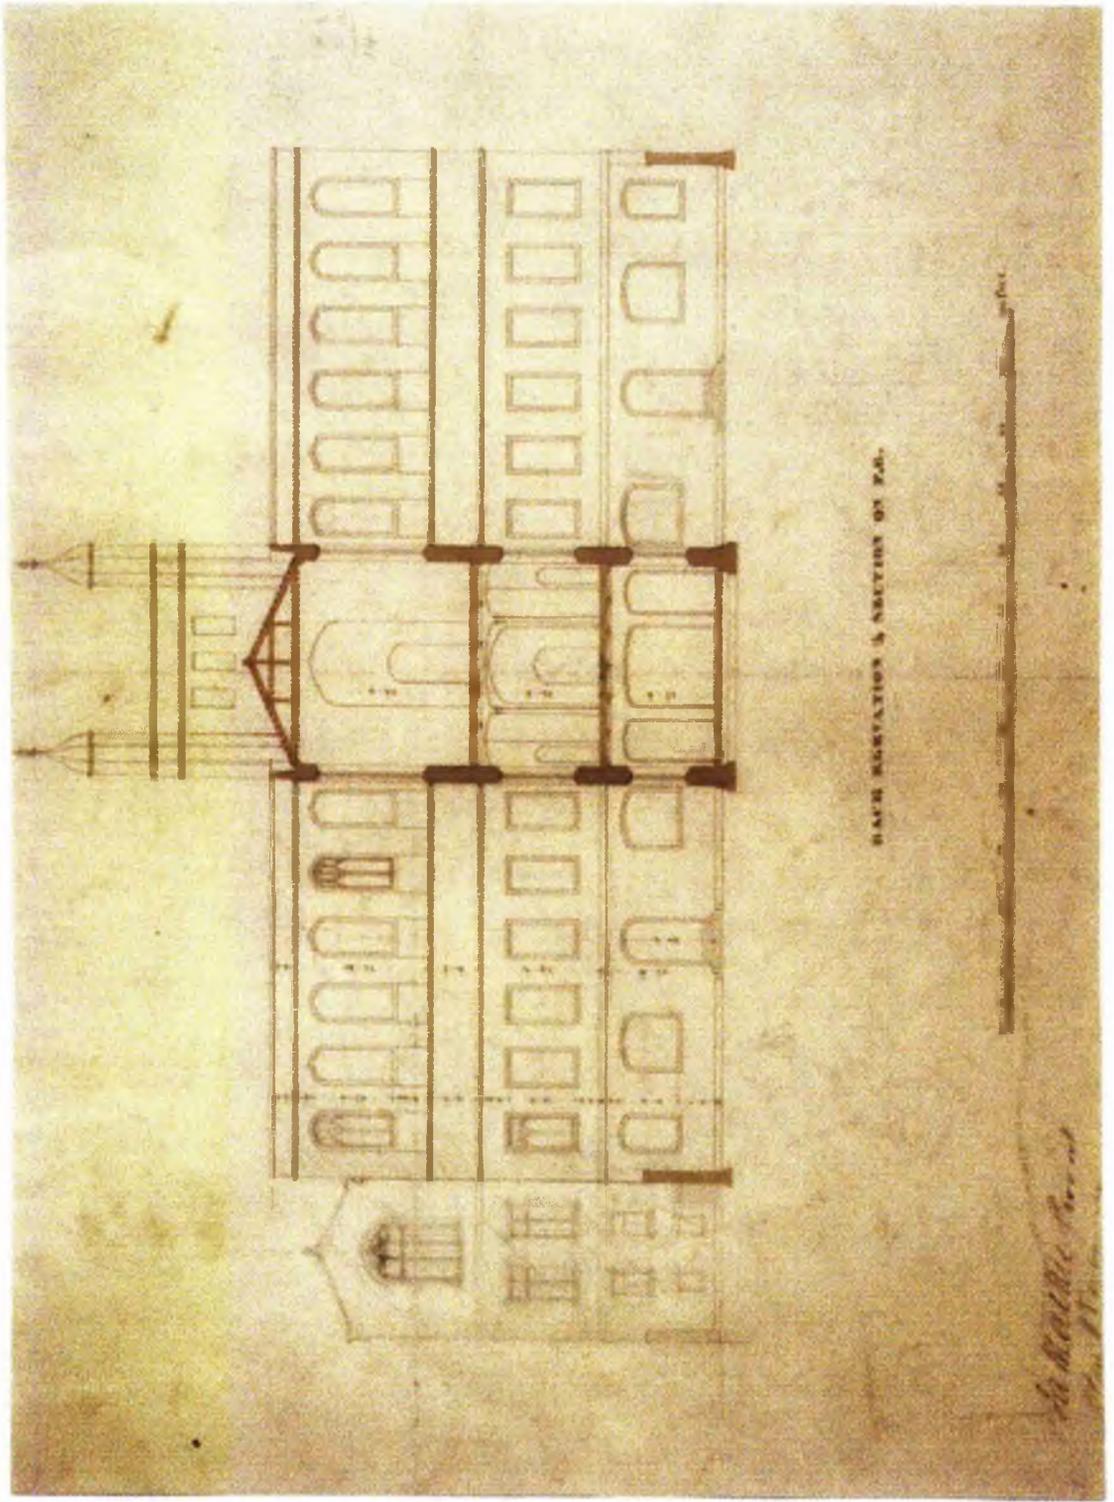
Marischal College. Back elevation and section F-G. A.Simpson, June,1836.
